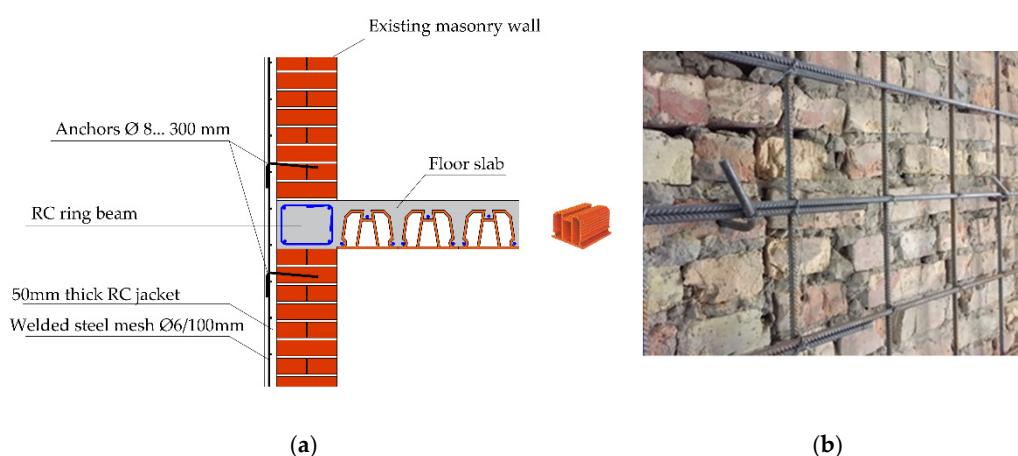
RC jackets: (a) vertical section of the wall and (b) an example of RC jacketing under construction [30].
